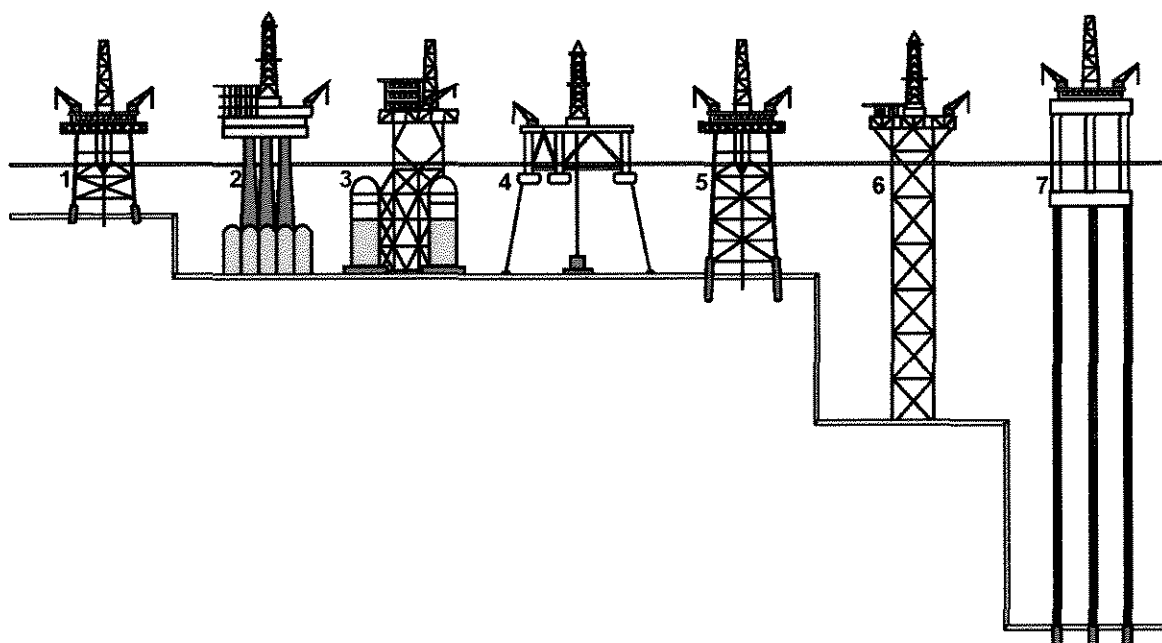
Platform types. (1) Steel jacketed platform (shallow water); (2) concrete gravity structure; (3) steel gravity structure; (4) floating production system; (5) steel jacketed platform (deep water); (6) compliant tower; and (7) tension leg platform (GRIFFIN, 2000a).
